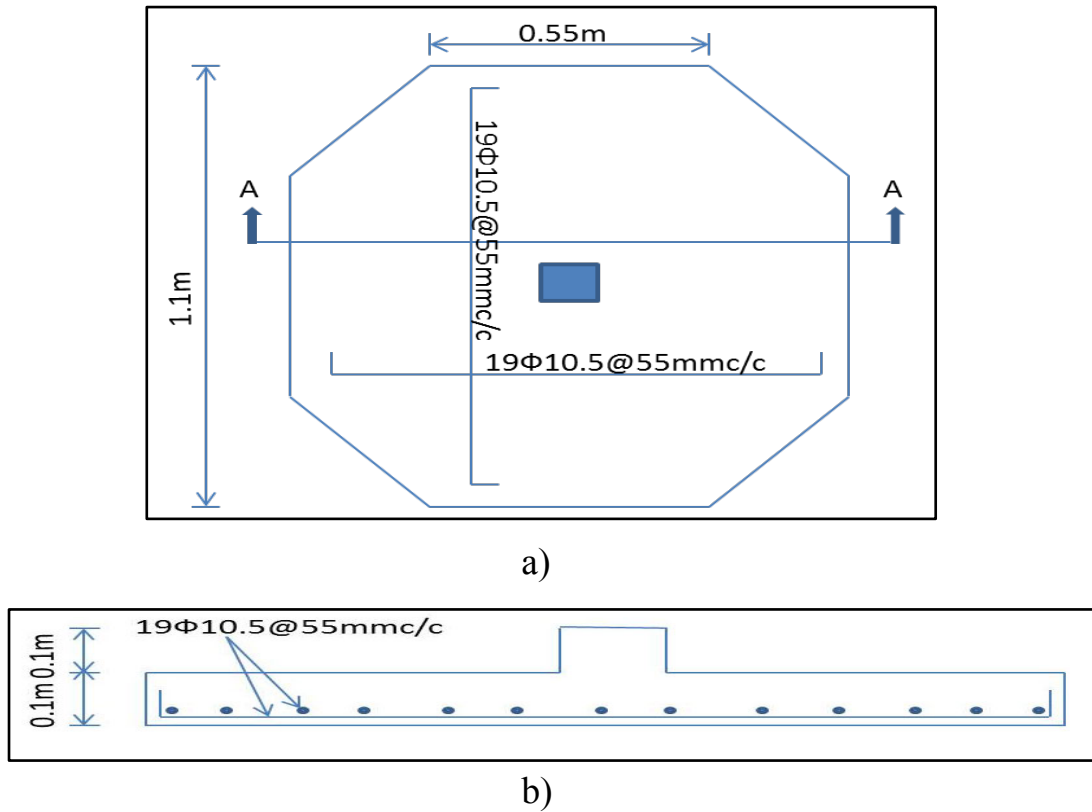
a) Slab specimen; b) Section A-A in tested slab
